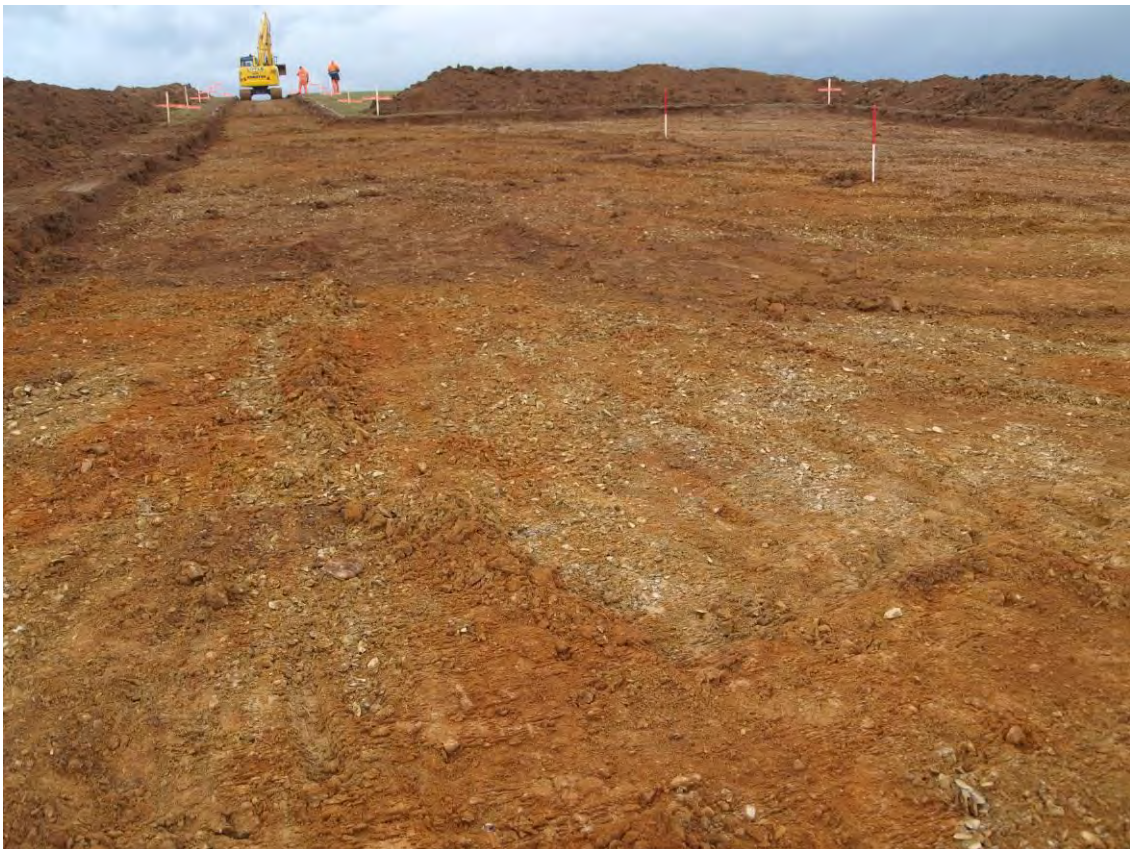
Area stripped for the crane pad foundations, facing NE. 1m scales.
